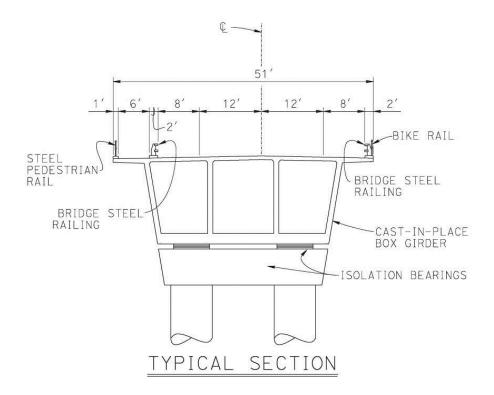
Section of Proposed Cast-In-Place Bridge Looking North, Pedestrian Walkway on Left
